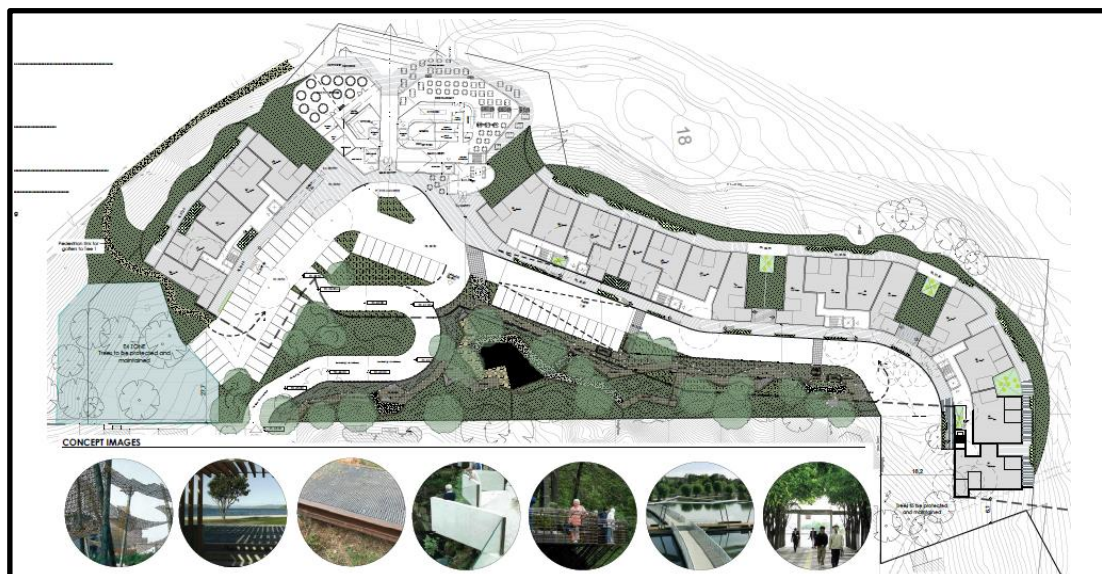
Extract from proposed Landscape Plan – Somewhere Landscape Architects
